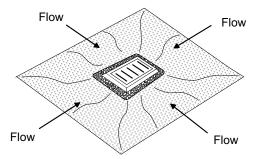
Perspective of Excavated Drop Inlet Protection
